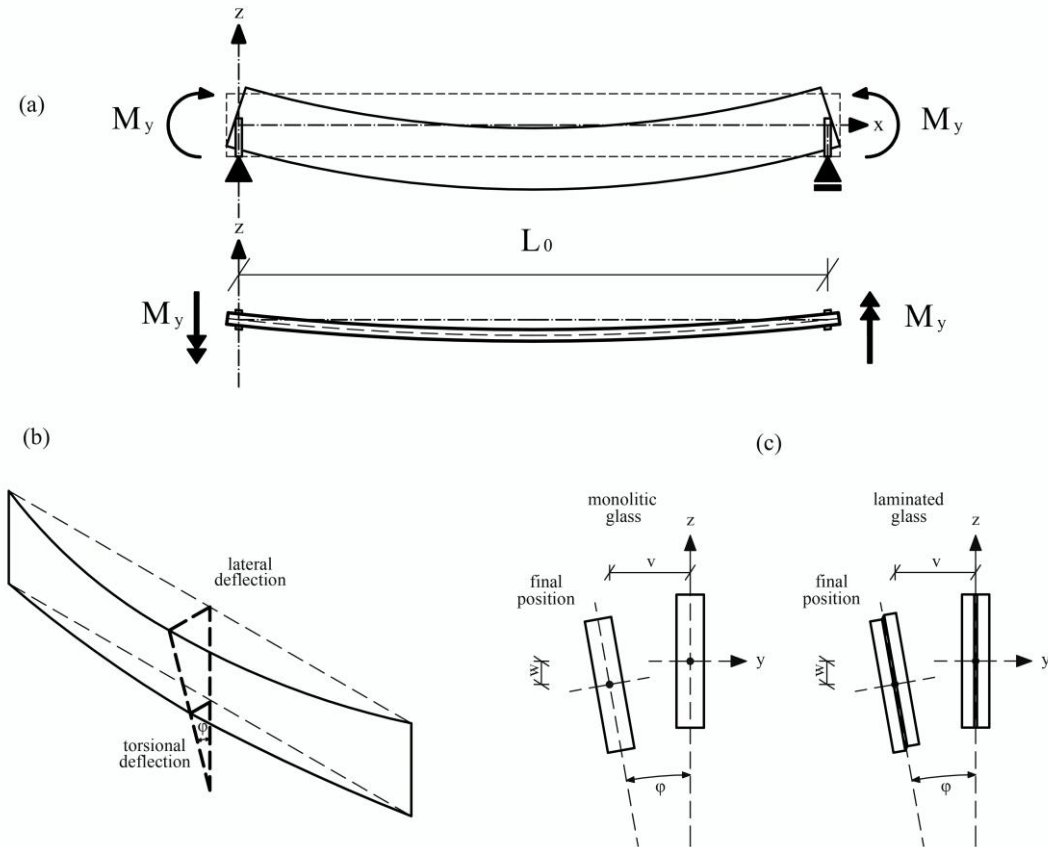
Lateral-torsional buckling of a simply supported beam: (a) overview; (b) deformation of beam; (c) cross-section deformation for monolithic and laminated glass. Figures adapted from [46, 50]
